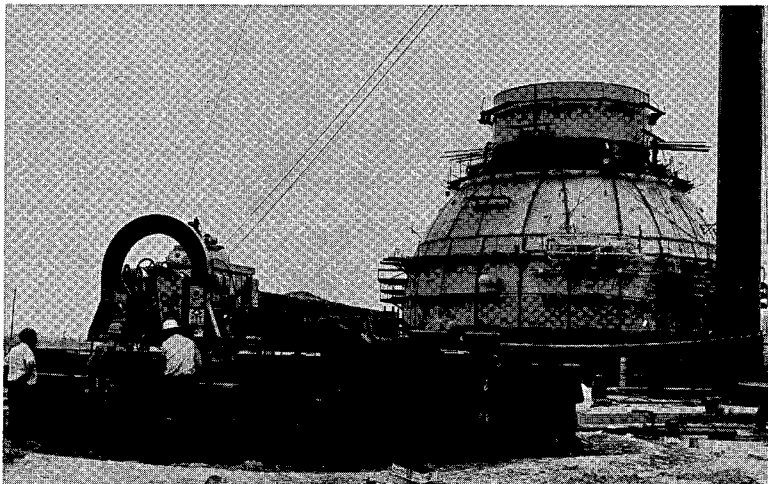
Grooves for O-ring flange seals can be machined in the field to close tolerances with equipment such as the patented device CB&I used at left on the Oyster Creek containment flange
